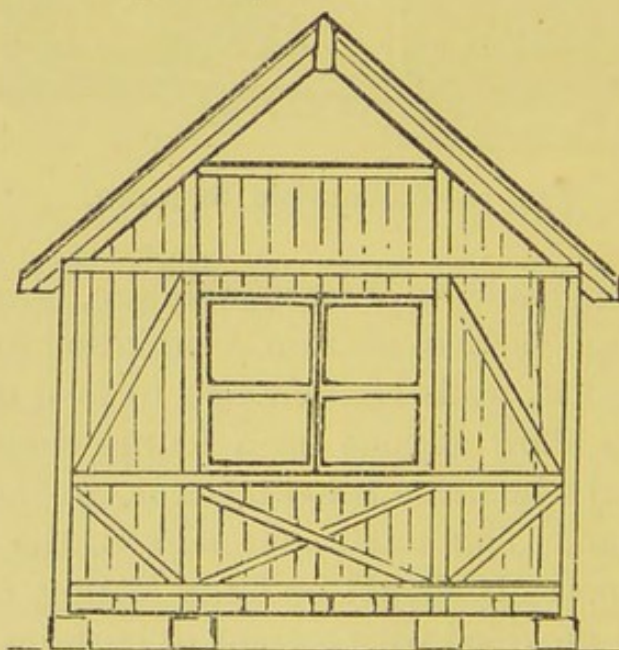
SHELTER WITH STEEP-PITCHED ROOF—END VIEW.
